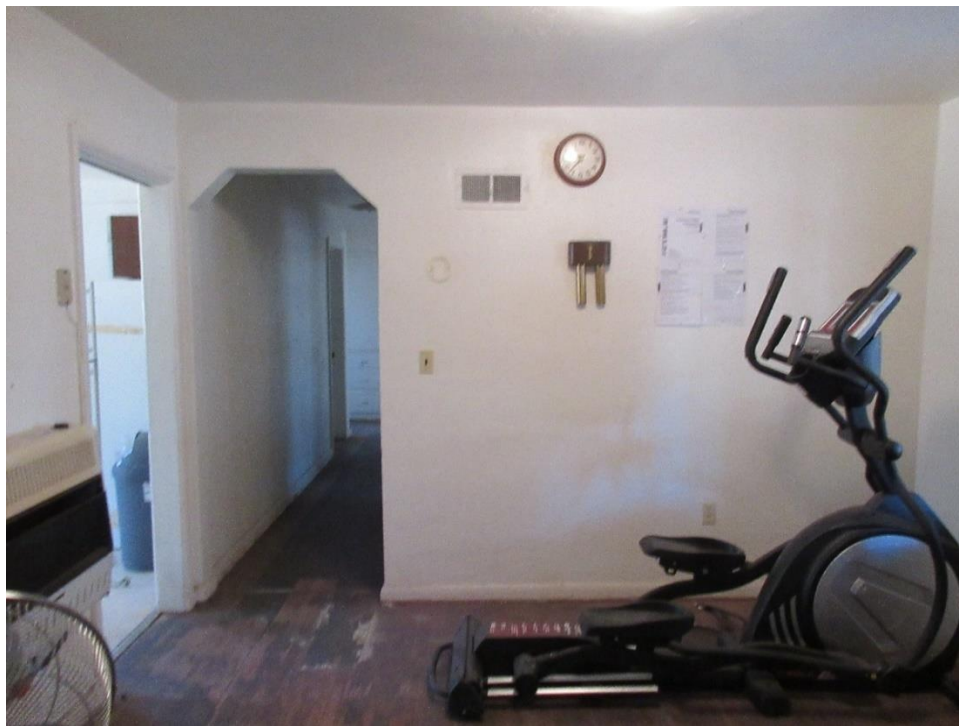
Dining room area of Weight Room (11-54), view from living room.
